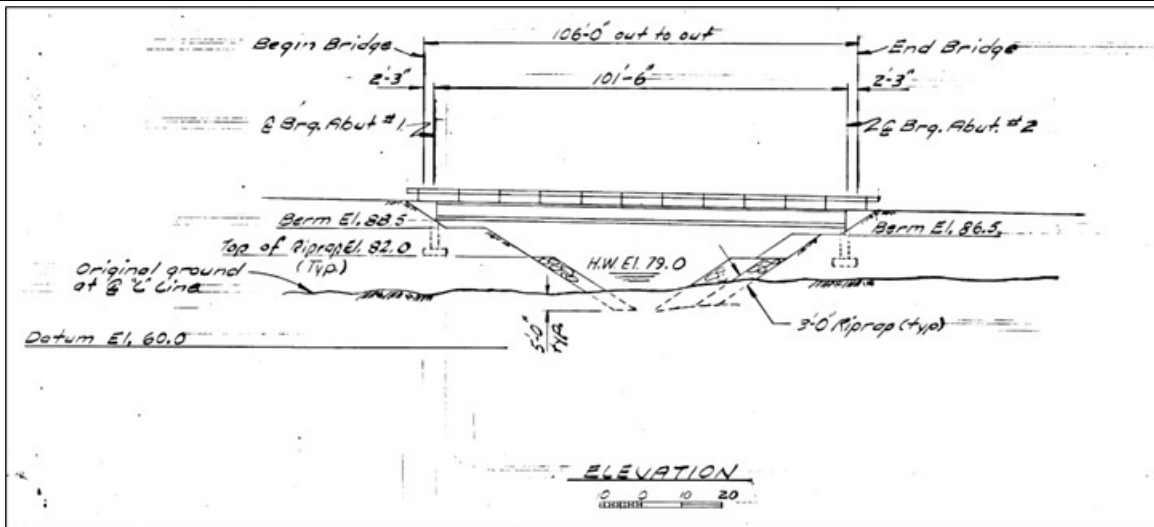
New Glenn Highway Bridge; Elevation View (MOA 72 Datum).
